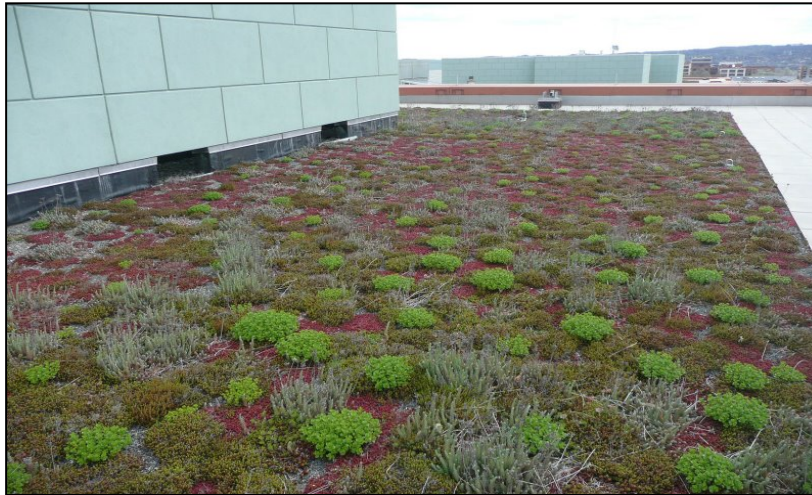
Vegetated Roof, Washington, DC (USEPA, picasaweb)
